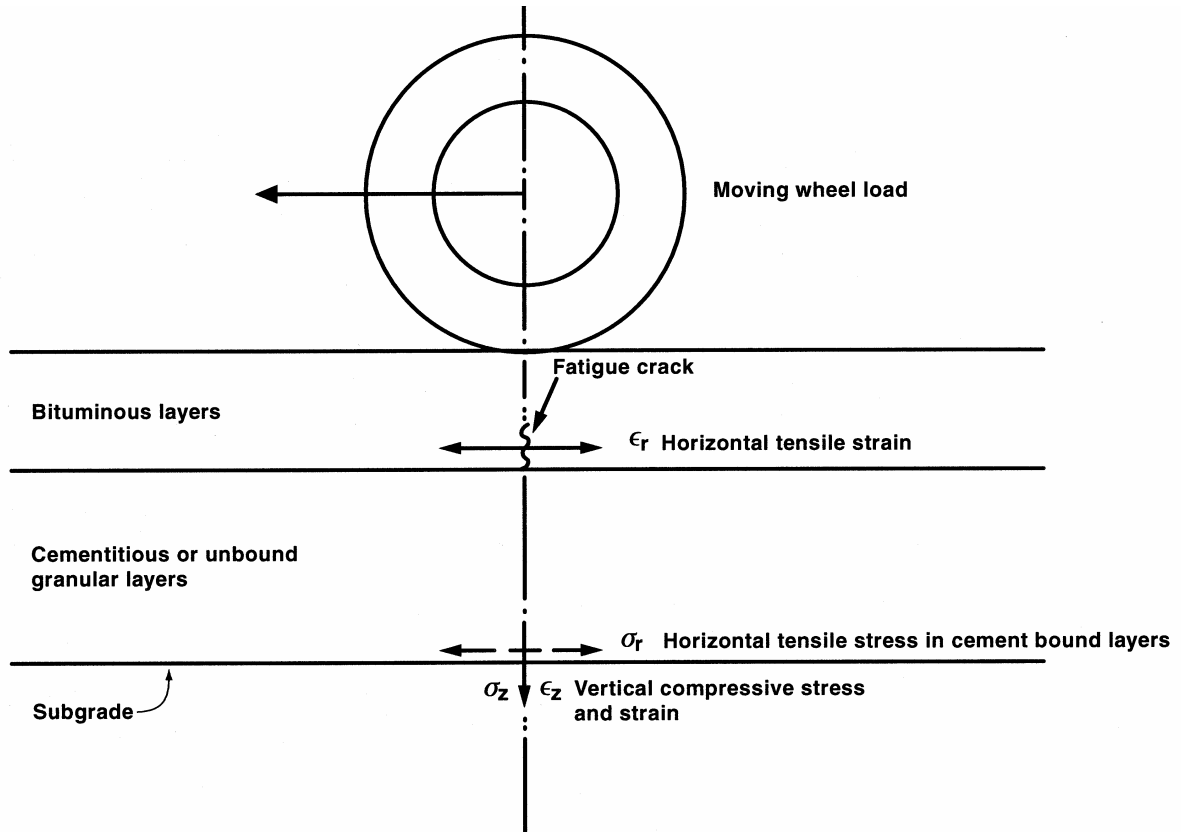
Critical Stresses and Strains in a Flexible Pavement
